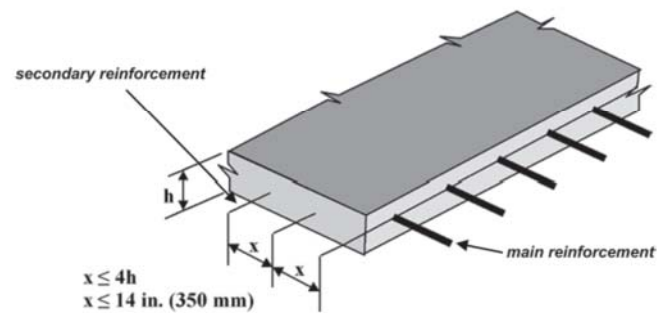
Maximum spacing between shrinkage and temperature reinforcement in slabs.
